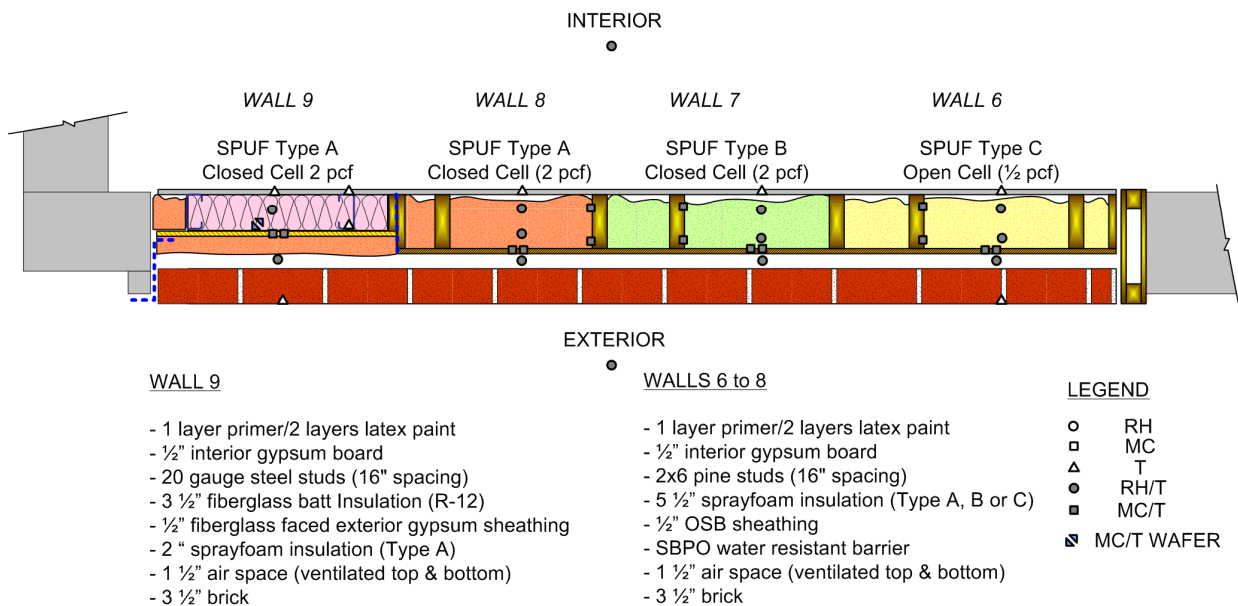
BEGhut Full Scale Wall Tests (Finch et al 2007)
